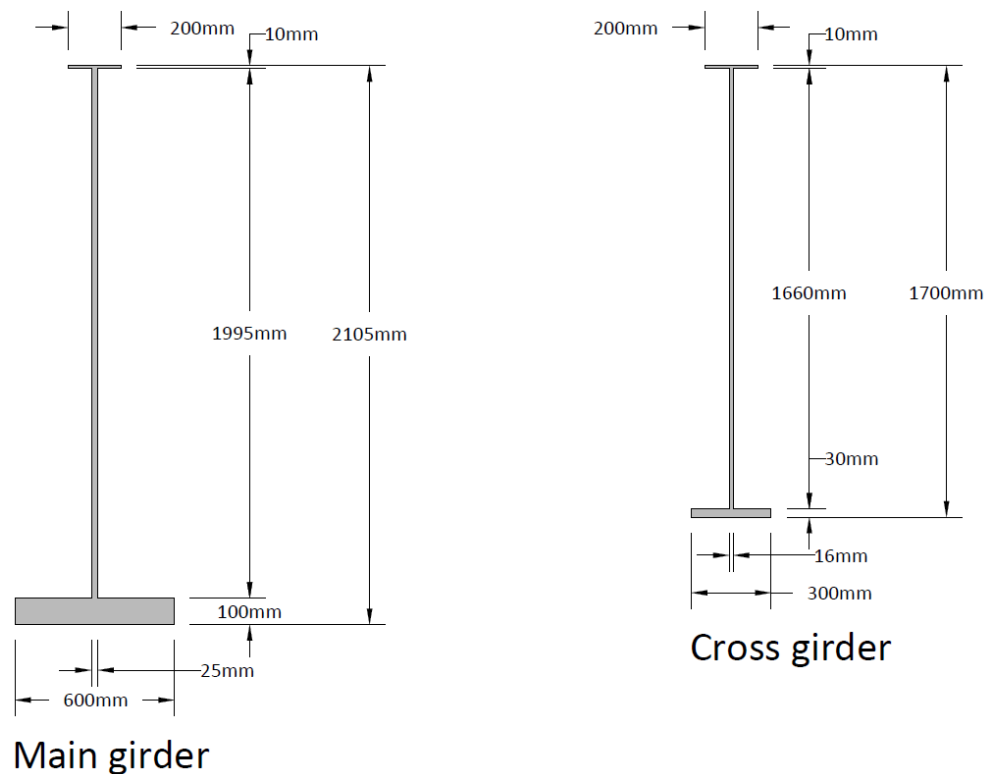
Cross sections of the main and cross girders – non-hybrid
